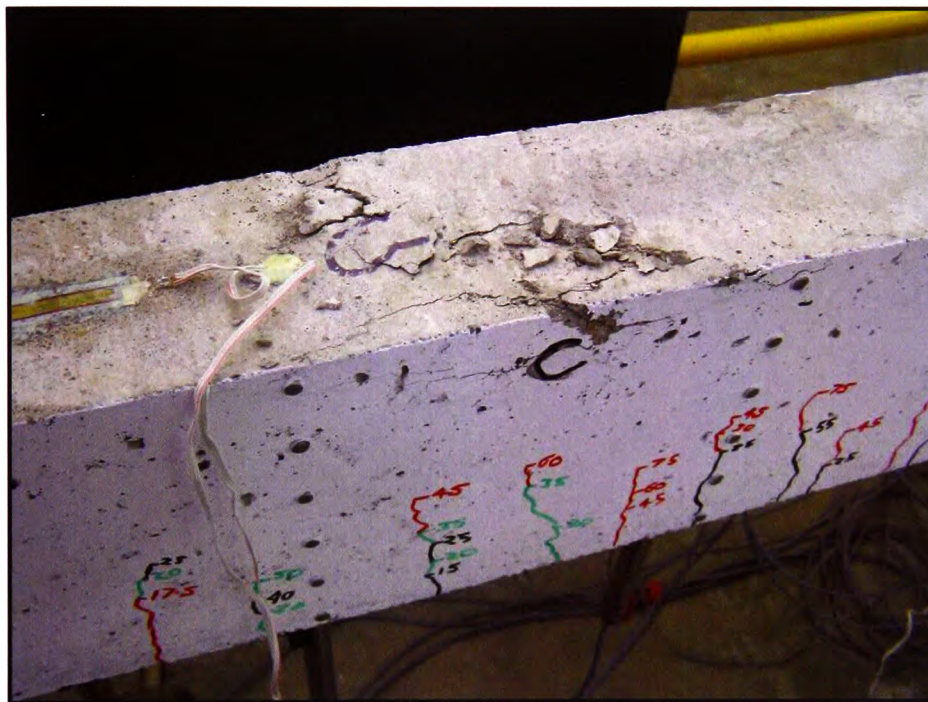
Photograph of compressive concrete failure of 16CON
